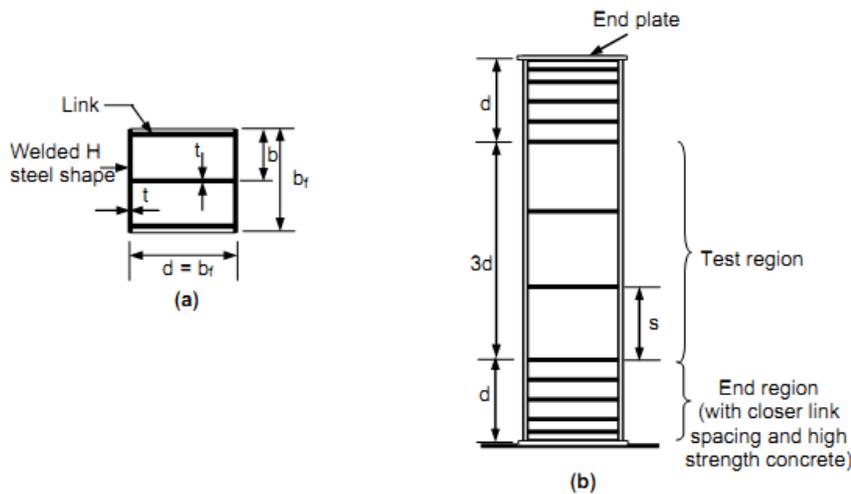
Typical PEC Test Column, (a) Cross-section, (b) Elevation
